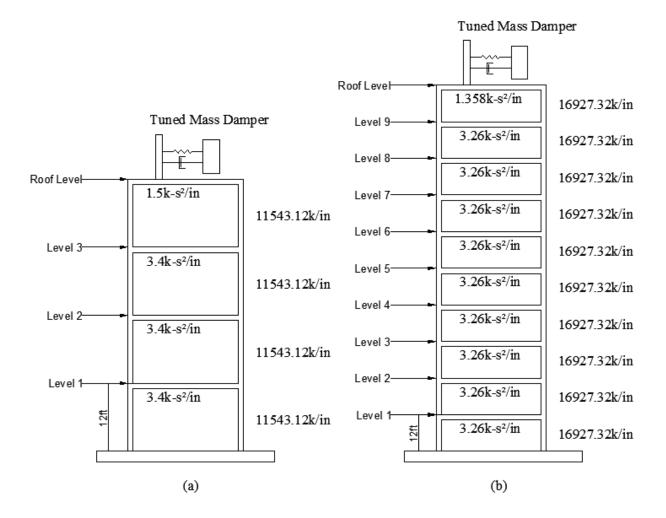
Two MODF buildings, (a) 4-story building; (b) 10-story building
